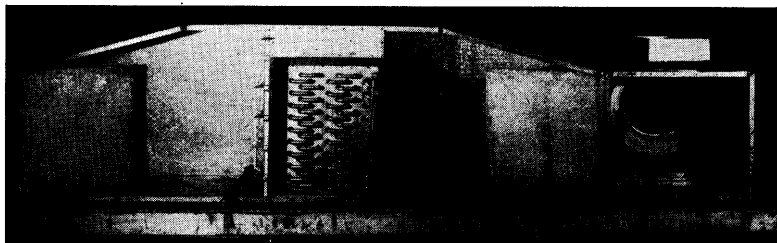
INTERIOR VIEW OF COOLING UNIT WHILE UNDER CONSTRUCTION
